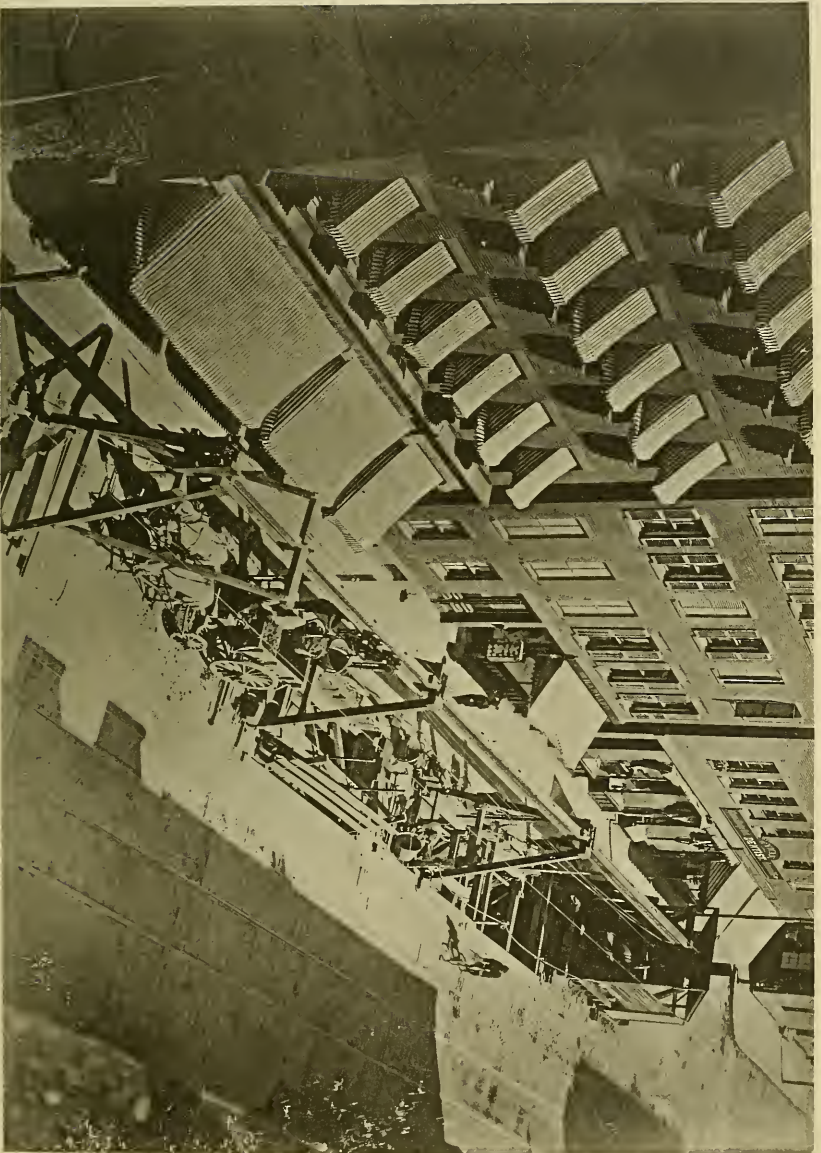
SECTION 4, EXCAVATING-MACHINE ON TREMONT STREET.
